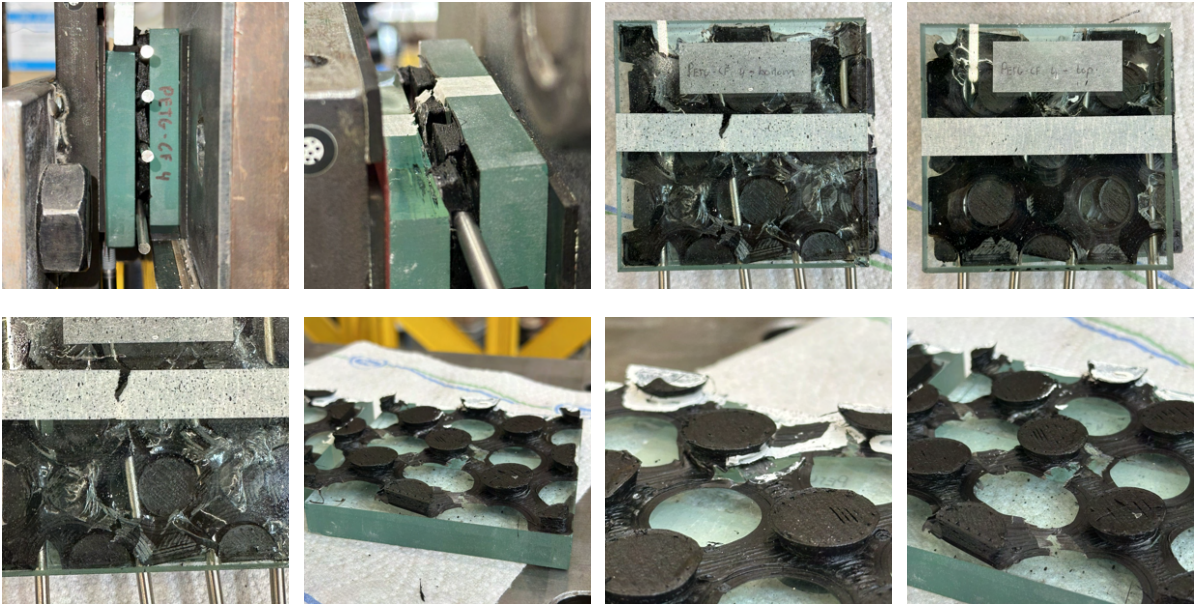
Specimen S4 — PETG-CF, Geometry 4 after testing
